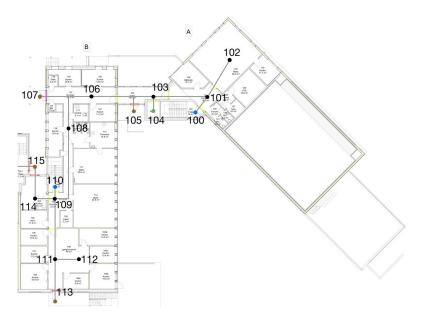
Network layout Buildings A and B on the 1st floor.
